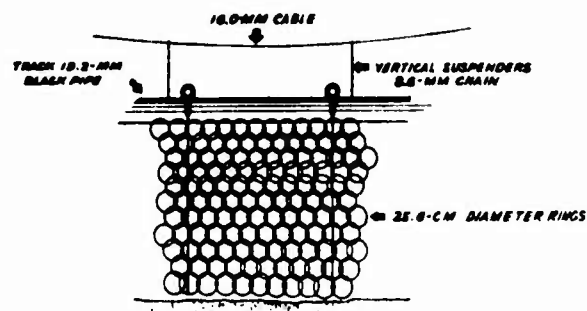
ELEVATION VIEW OF A SECTION OF THE TRAVELLING DEBRIS SCREEN⁽¹⁾
